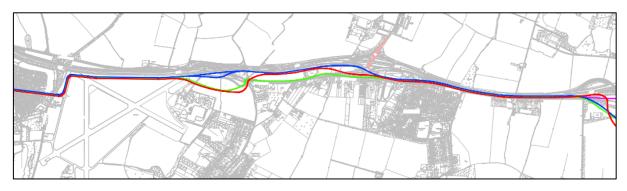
Section 2: Long Road to Junction 13 of the M11
